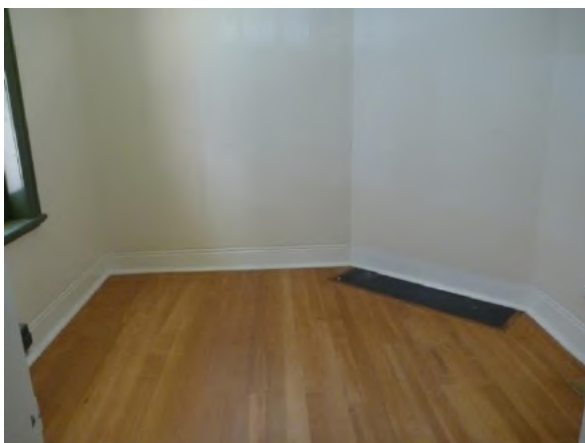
Front bedroom, showing timber floors and concrete hearth from the original corner fireplace (blocked up)—50 / 46–56 Gloucester Street. (Source: GML Heritage, June 2015)
